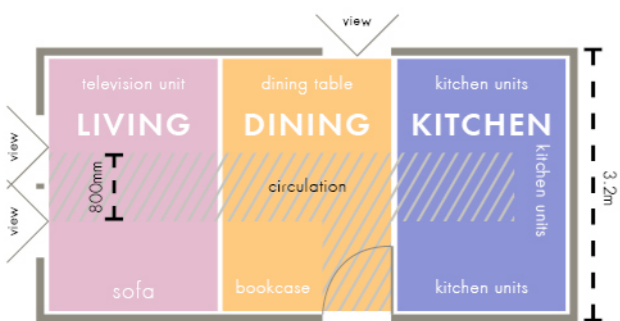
When designing open plan layouts, three distinct zones should be defined and able to accommodate appropriate furniture that does not compromise circulation or views out.
